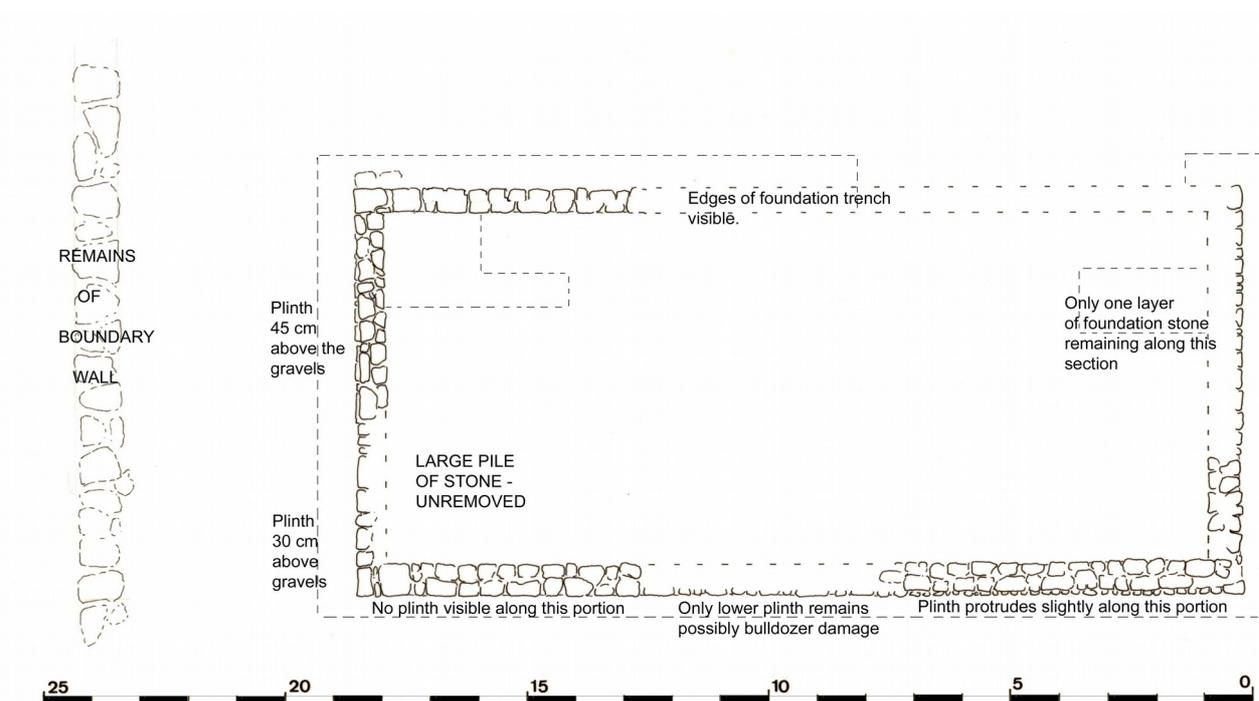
Skuifraam-2: Annotated floor plan of the structure. All surviving walls are of dressed stone and have plinths. (Scale in m).
